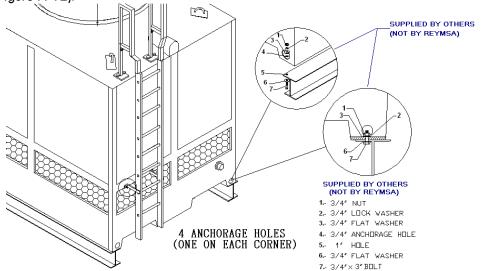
Installation - Typical Anchorage for Double Fan Tower
